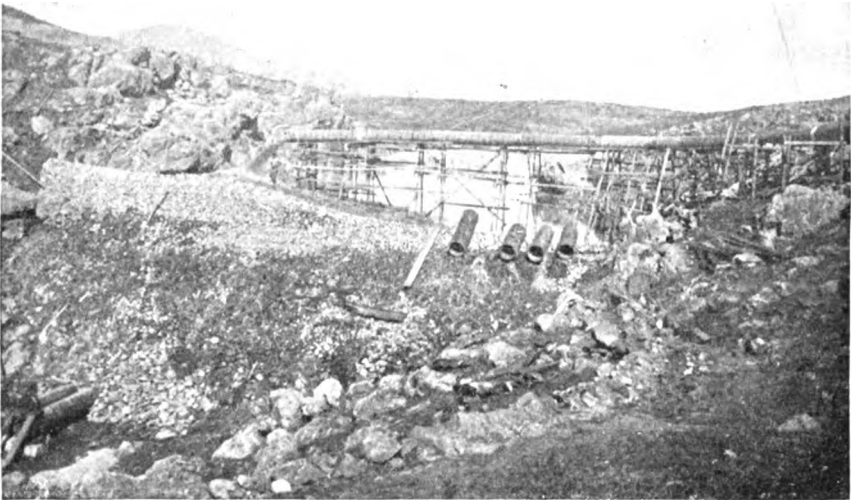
LA MESA HYDRAULIC-FILL DAM, SHOWING PIPE DISCHARGING MATERIAL ON THE DAM.
